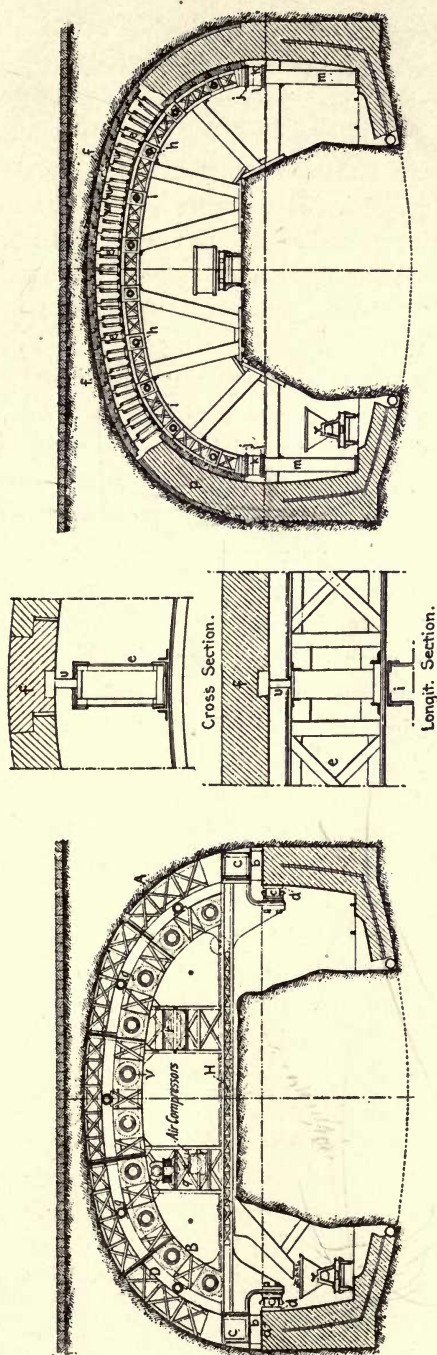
Roof-shield Used on the Orleans Railway in Paris.—*a*. Section back of the shield; *b*.—Details of the lagging support ing roof; *c*.—Section showing masonry construction, arch-centers and movable lagging.
